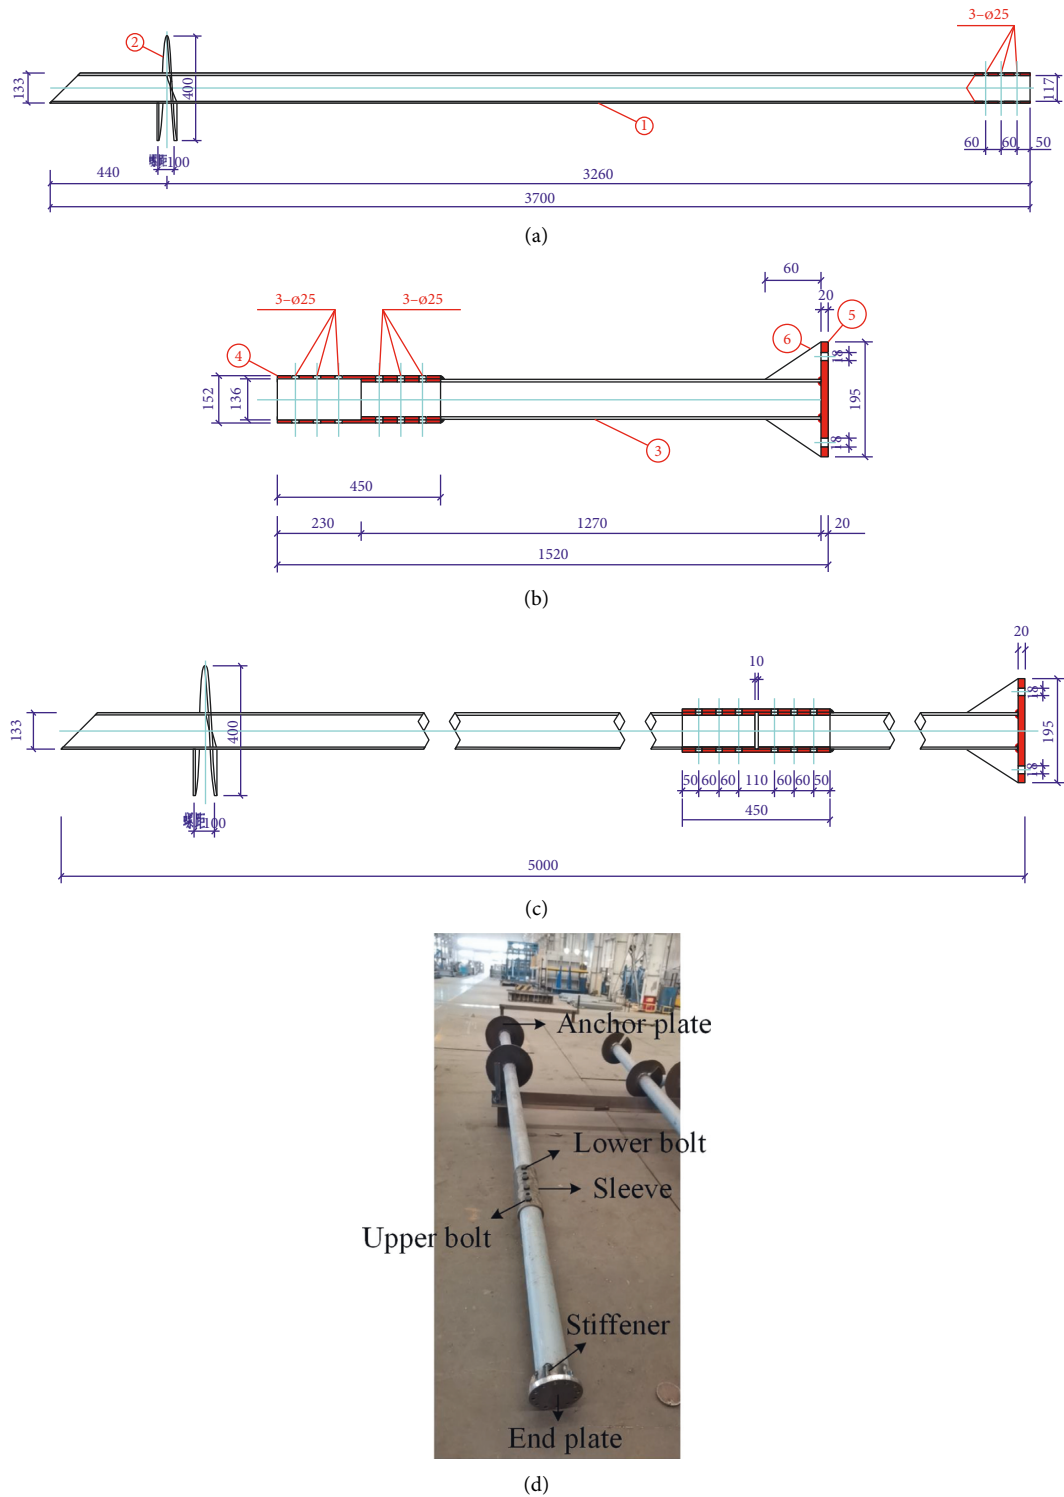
Spiral anchor specimen design. (a) Guide section: (1) lower bolt and (2) anchor plate. (b) Rod cap segment: (3) upper bolts, (4) sleeves, (5) end plates, and (6) stiffeners. (c) Integral assembly. (d) Specimens.
